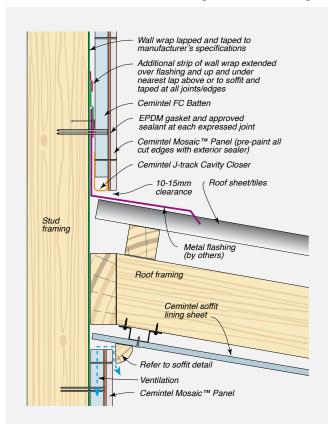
Junction of Mosaic Cladding with External Roofing
